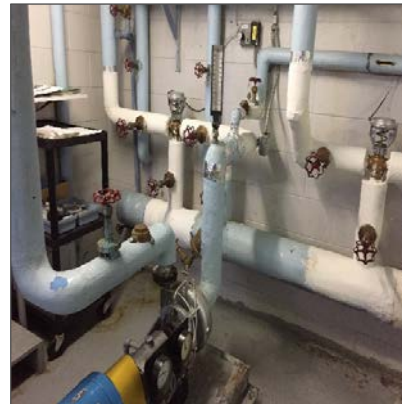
Asbestos-containing parging cement on pipe fittings, fair condition, Mechanical Room 1, East Basement of Middle Wing.
